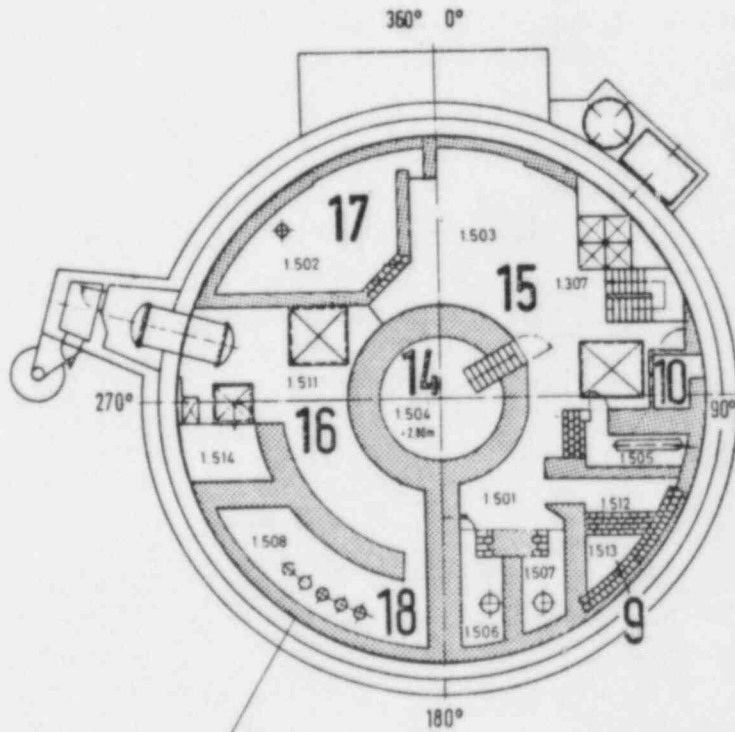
Plan of HDR containment at level E-E (+5.4 m) (34-zones model)
